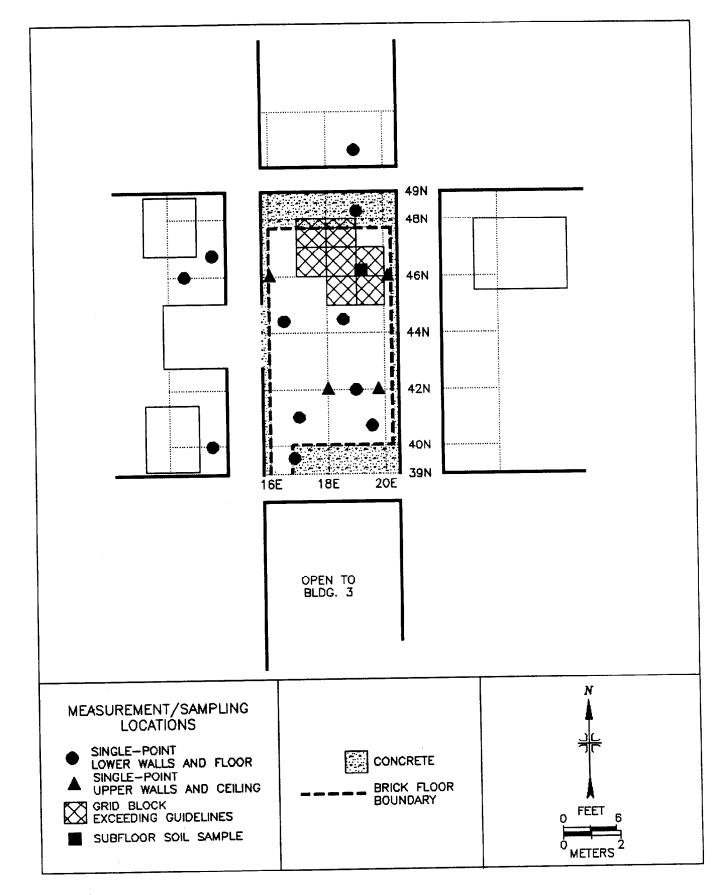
Building 8, Room B — Measurement and Sampling Locations
